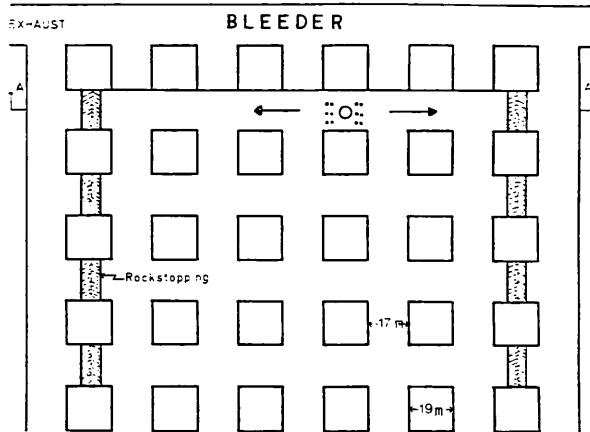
Plan View of the Room and Pillar-Bleeder Method
